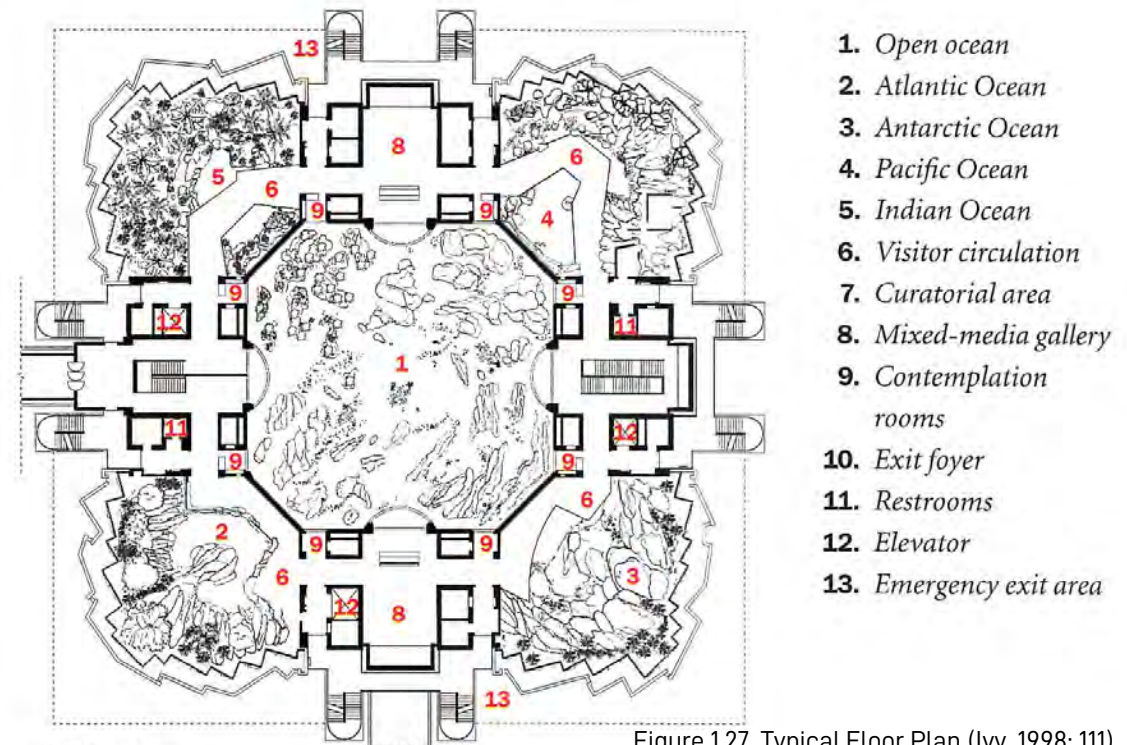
Typical Floor Plan (Ivy, 1998: 111)
